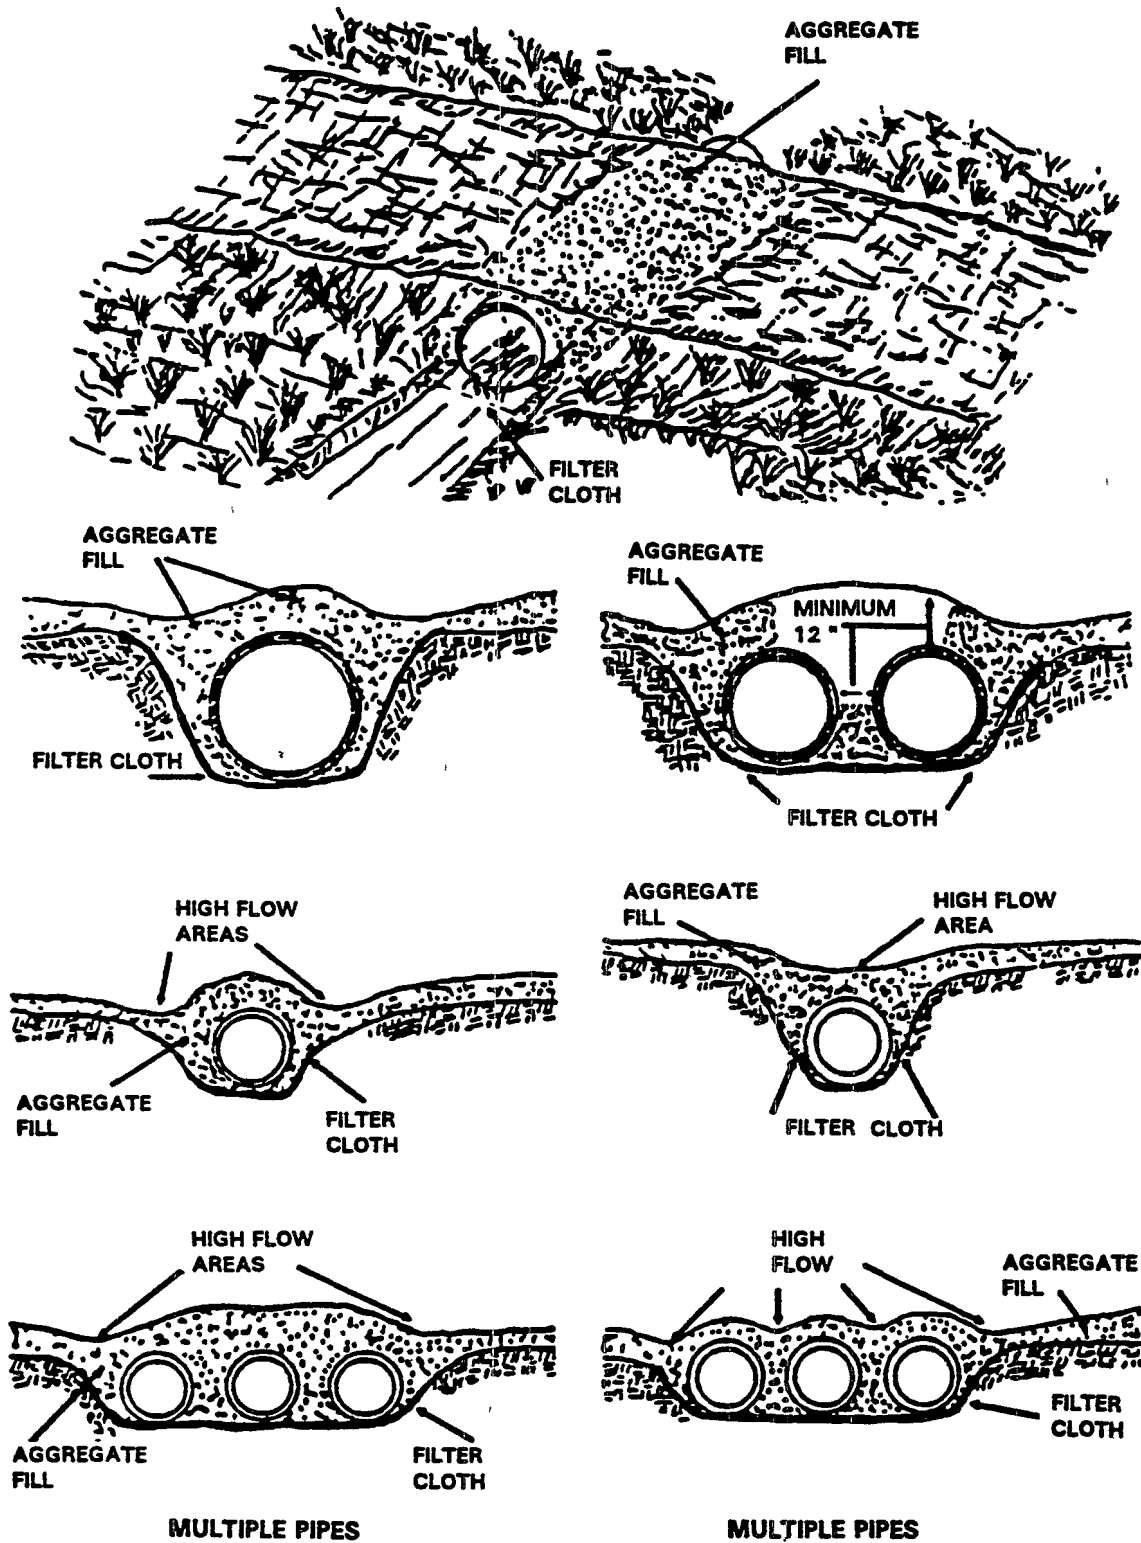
TEMPORARY ACCESS CULVERT
